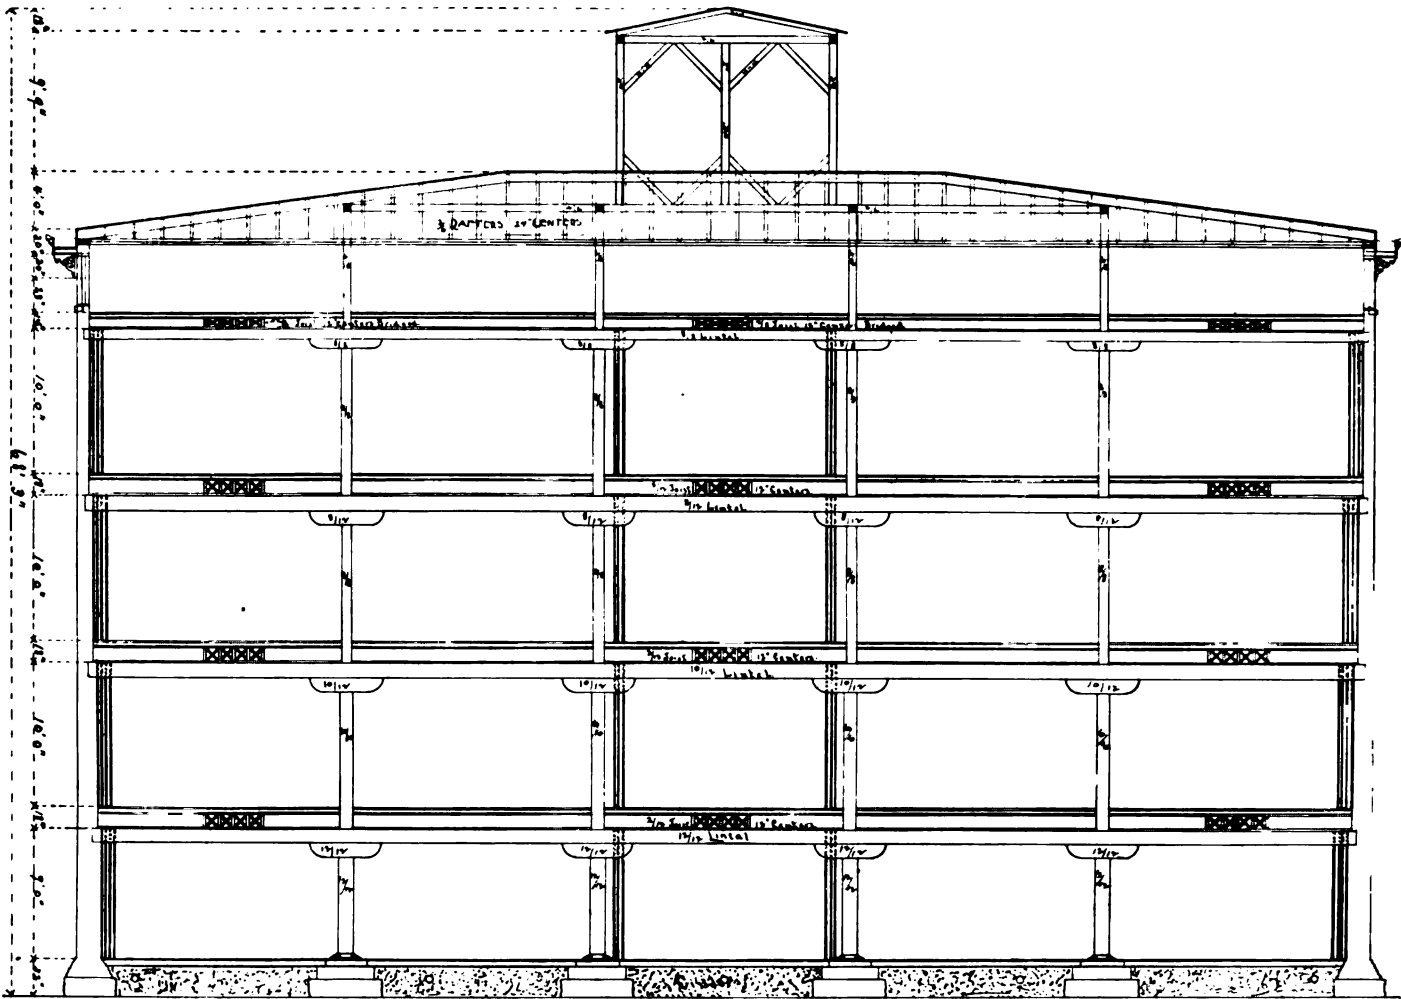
LONGITUDINAL SECTIONAL VIEW, TOLEDO COLD STORAGE CO.'S NEW WAREHOUSE.
